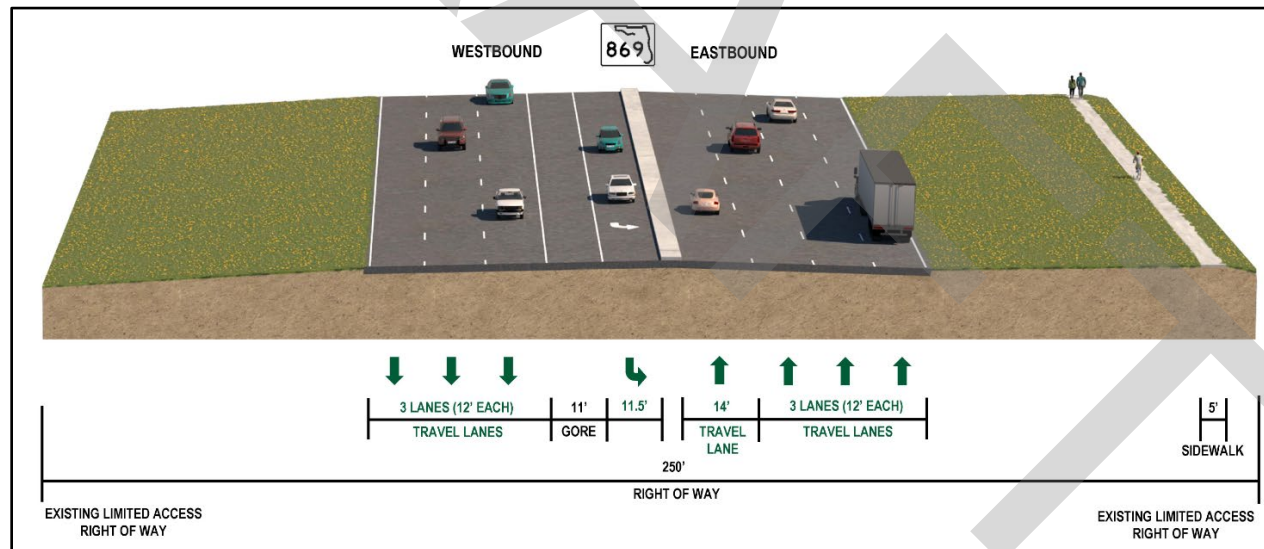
Existing Roadway Section between Florida's Turnpike and Powerline Road
